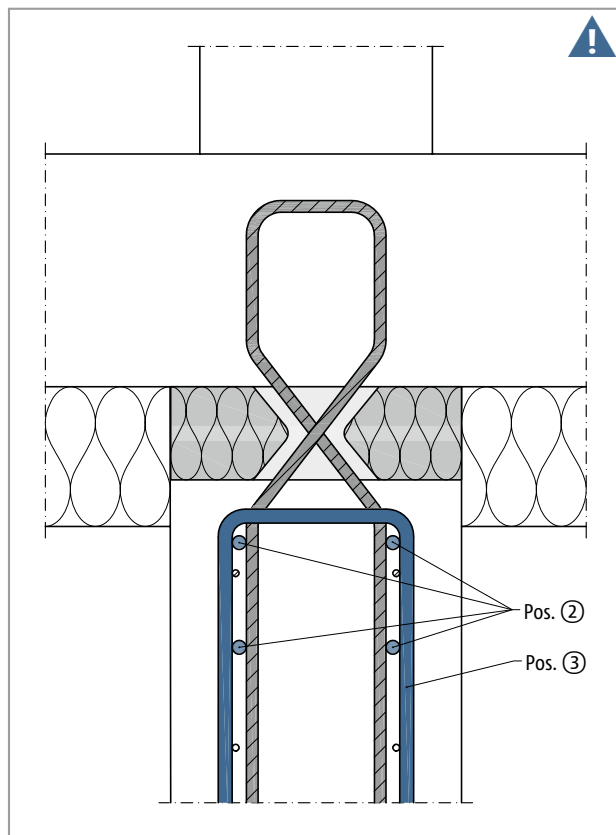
Schöck Sconnex® type W-N-VH: On-site reinforcement variant A; the external steel bar Pos. 2 supports the shear force bars of the Schöck Sconnex® against the component surface
